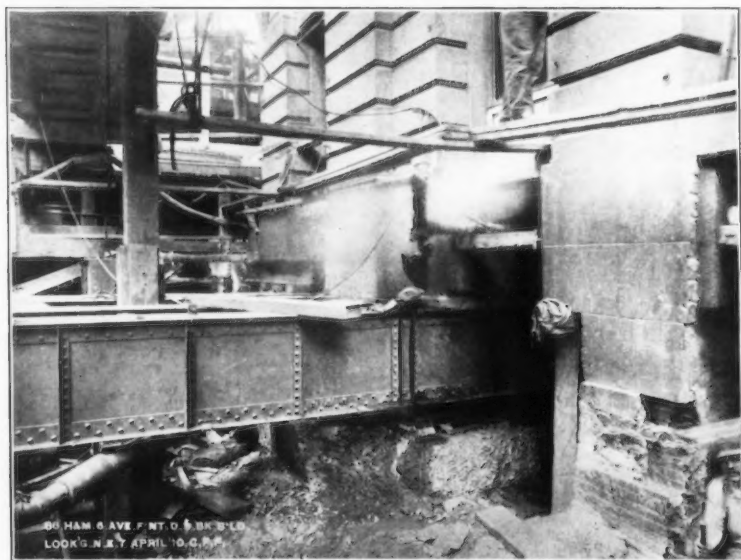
GIRDER NEEDLES USED IN SUPPORTING THE BANK BUILDING.
